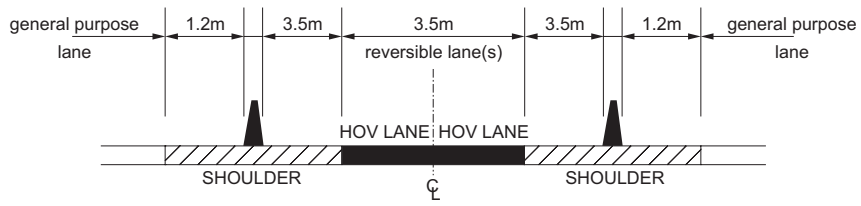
Barrier Separated Reversible Cross Section
